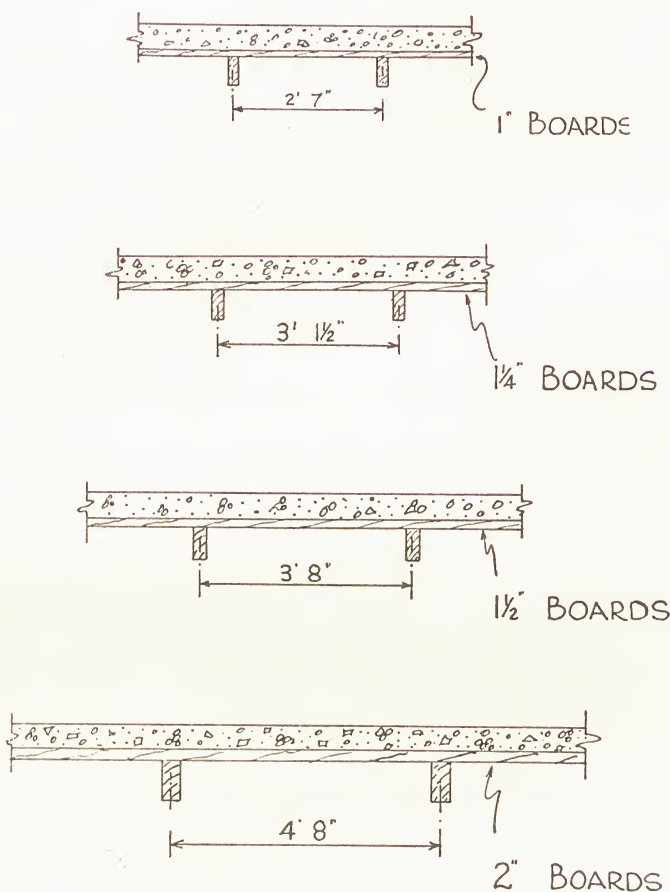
Shuttering or formwork for reinforced concrete slabs.
